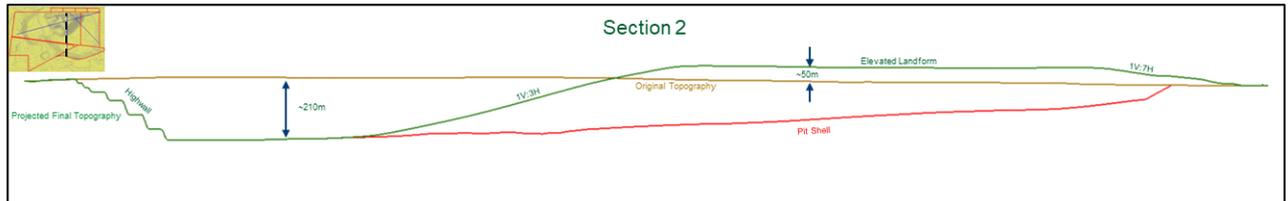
Section 2 – Partially backfilled pit and elevated waste dump to the south of the final pit
